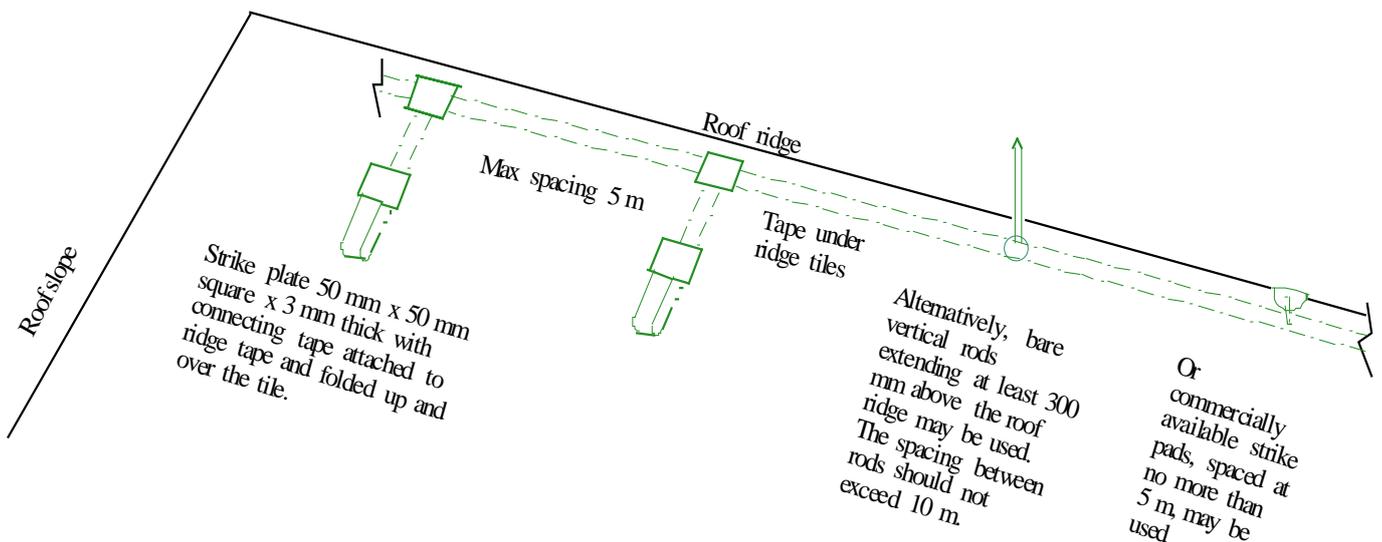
Air terminations for ridge conductor placed under the ridge tiles
